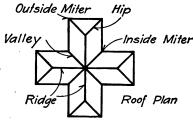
Plan of Hipped Roof, Showing Outside and Inside Miters.
